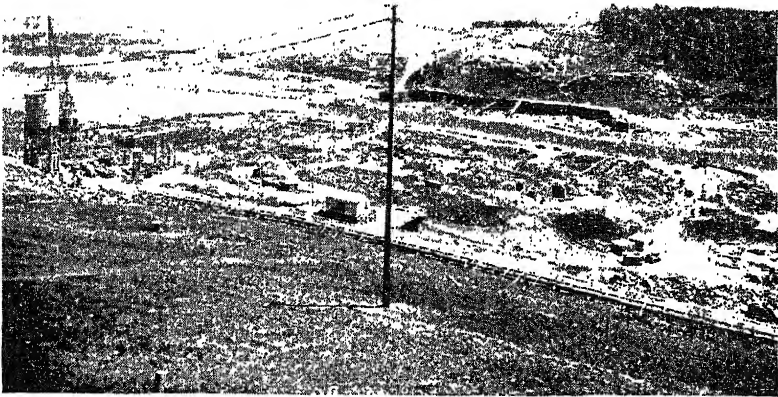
Excavation progress within cofferdam, looking upstream from main office on right bank, showing mixer plant silo at left.
